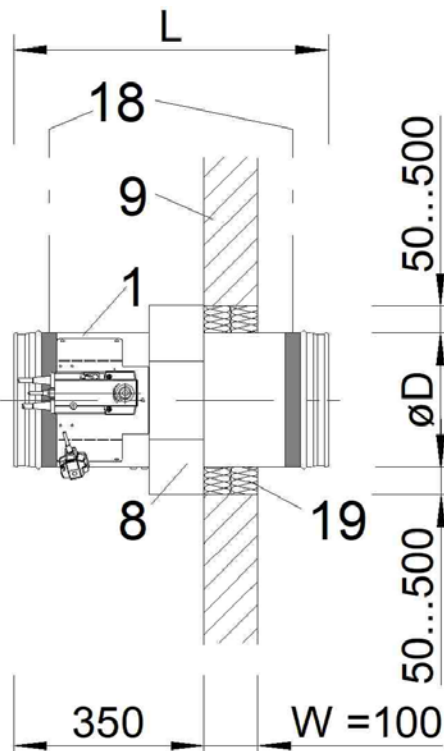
Installation in solid wall (wall thickness = 100 mm)
